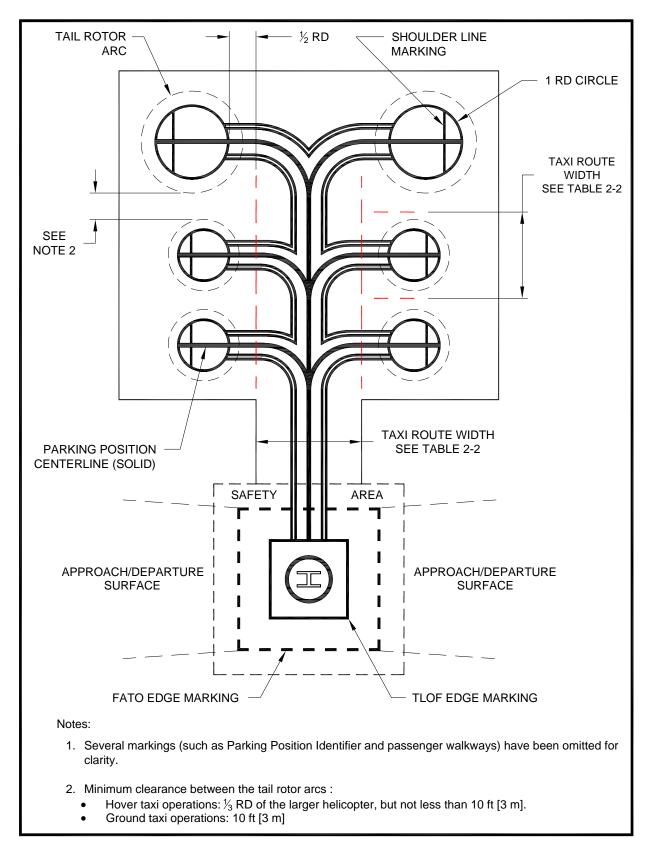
Parking Area Design – "Back-out" Parking Positions: General Aviation
